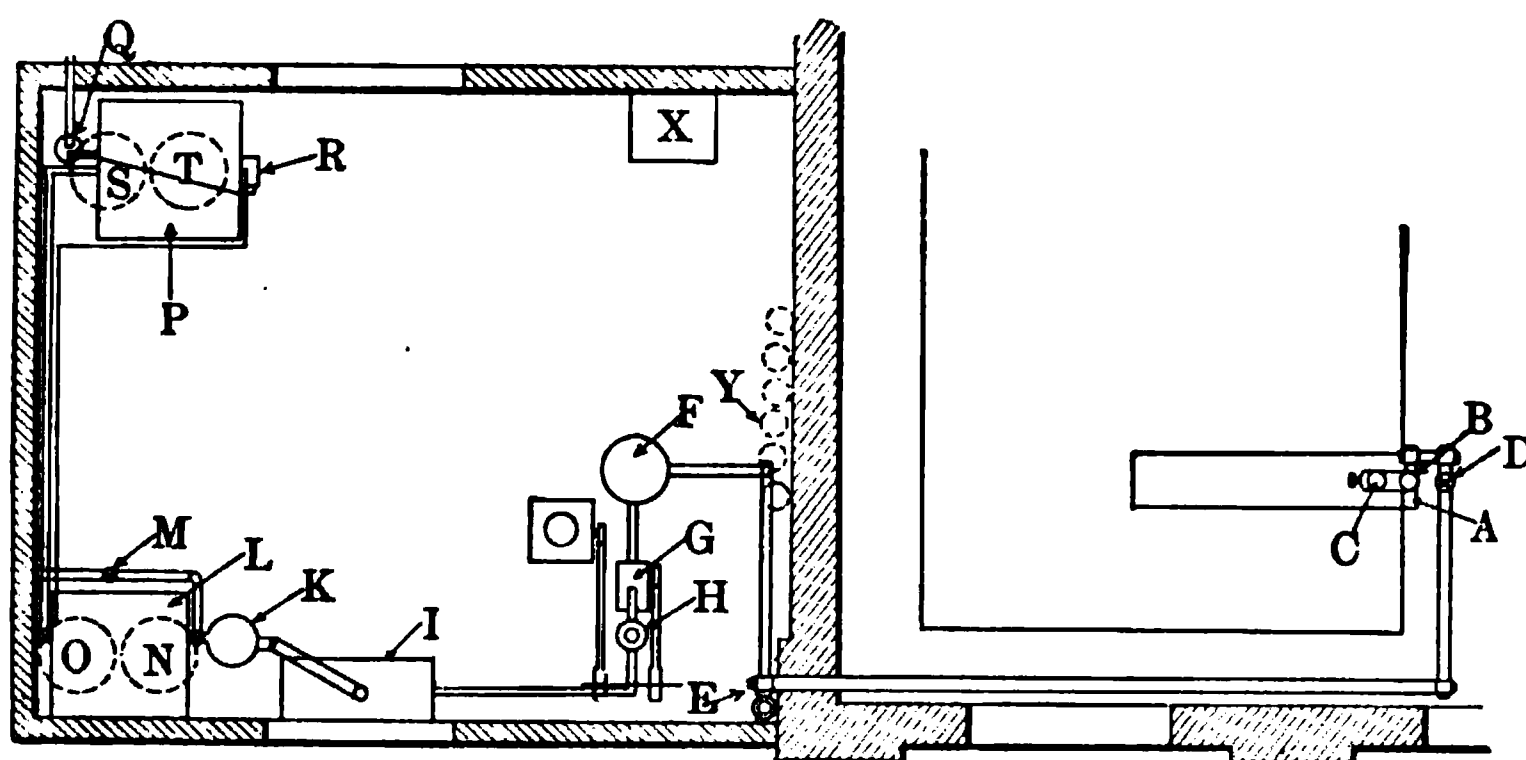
Floor plan of illuminating-gas experiment station.
